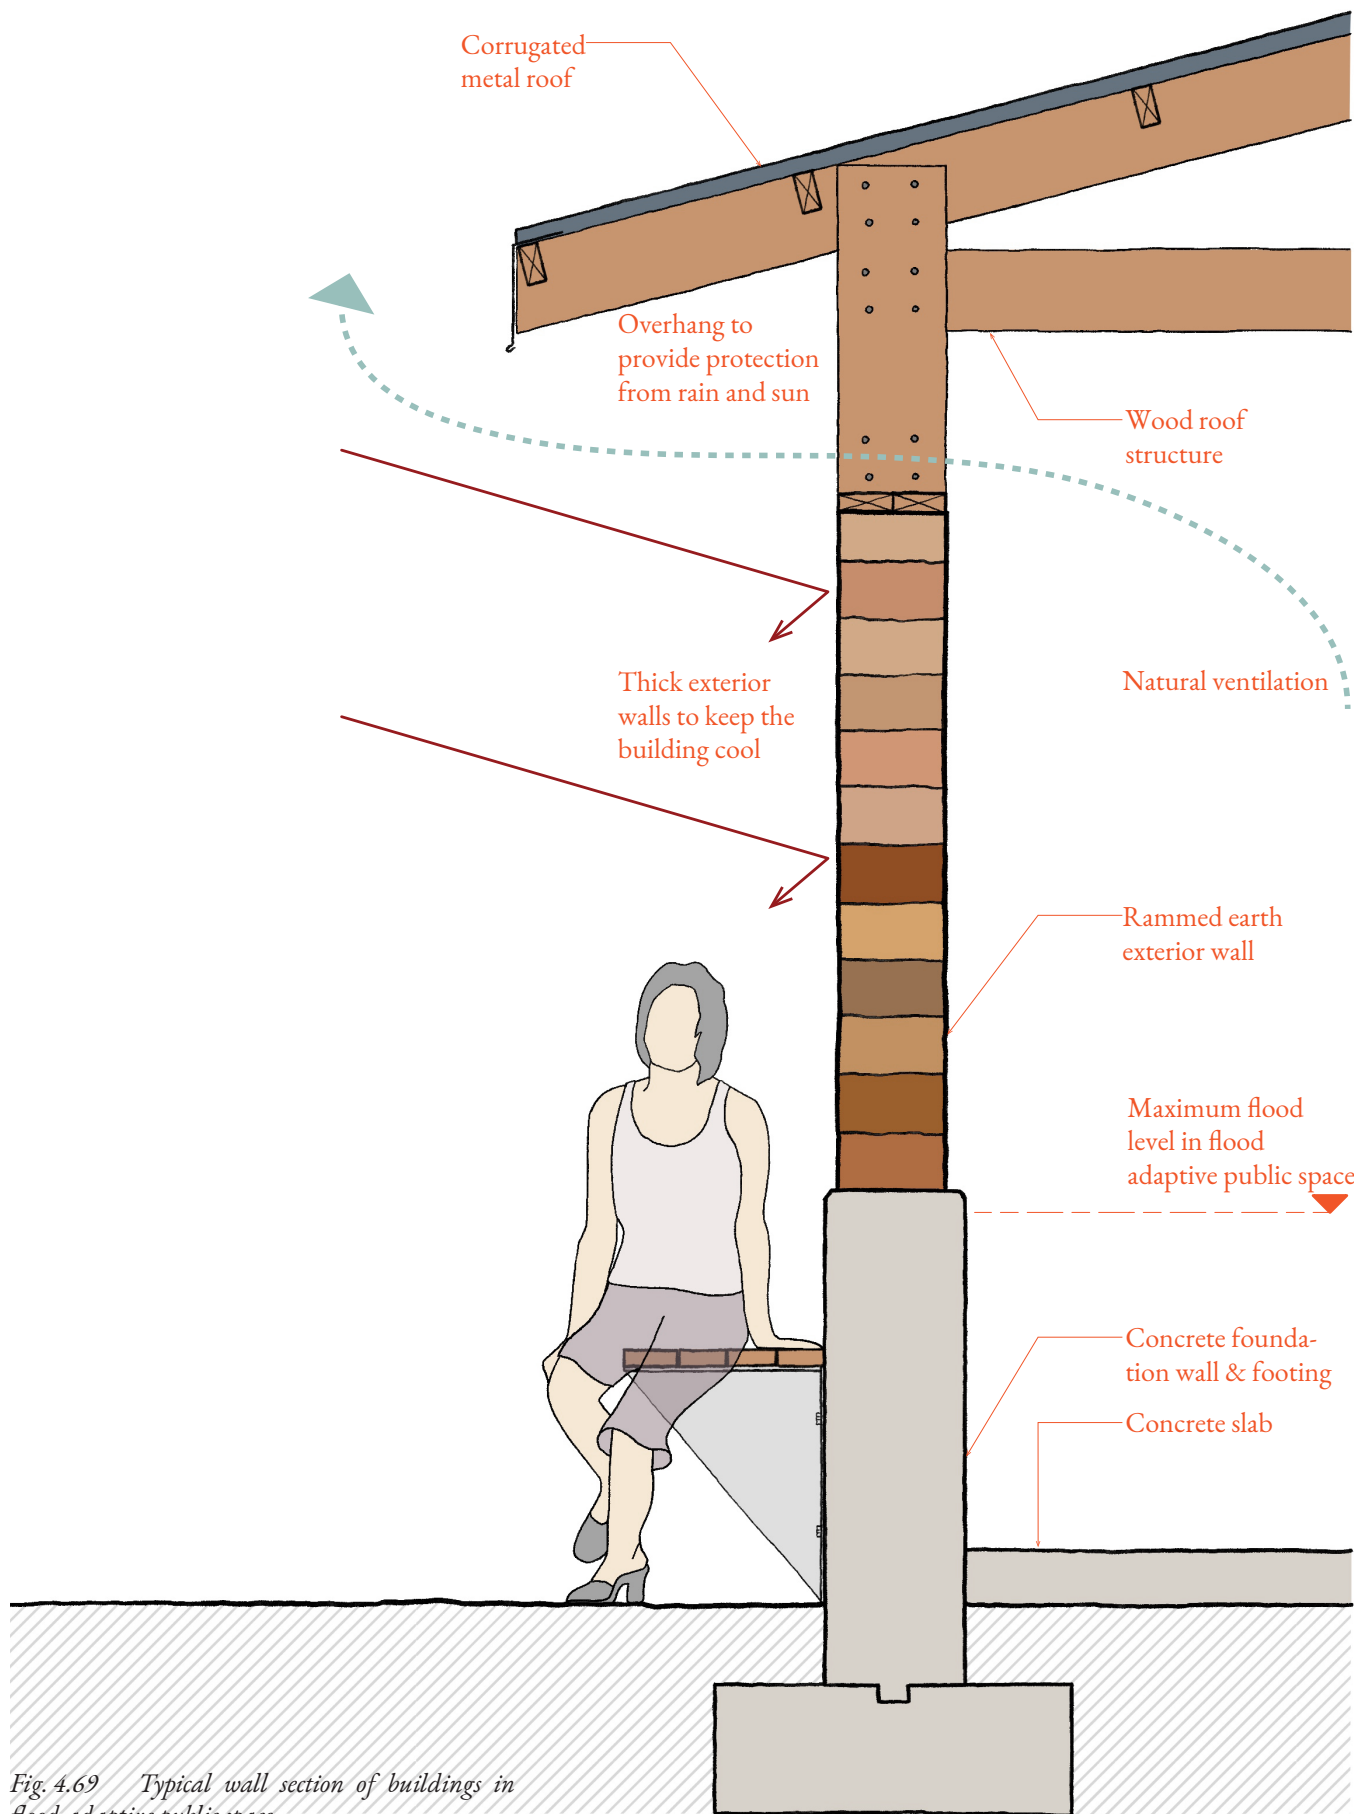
Typical wall section of buildings in flood-adaptive public space.
